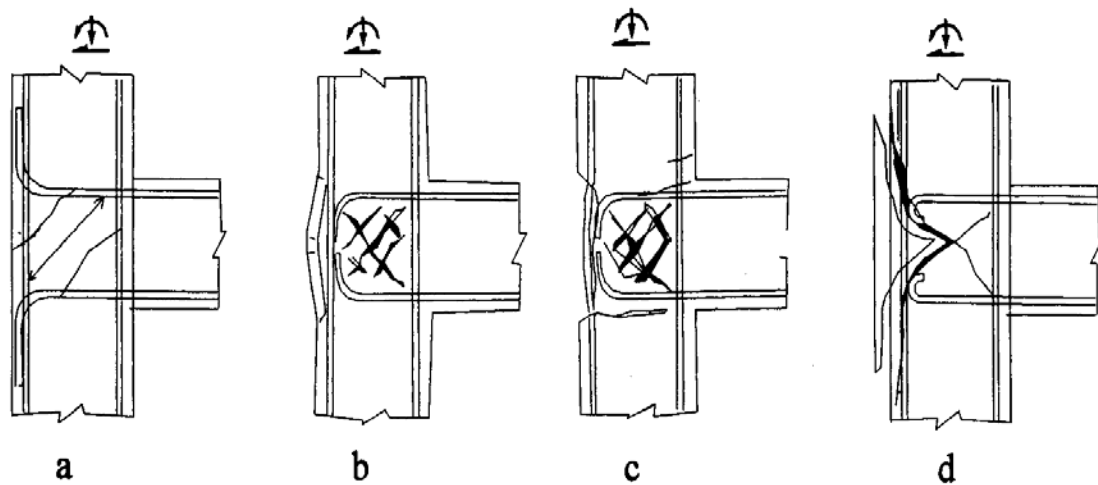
9: Alternative damage mechanisms for exterior Tee-joints: (a) beam bars bent away from joint region; (b), (c) beam bars bent in joint region; (d) end-hook anchorage: “concrete wedge” mechanism from [11]
